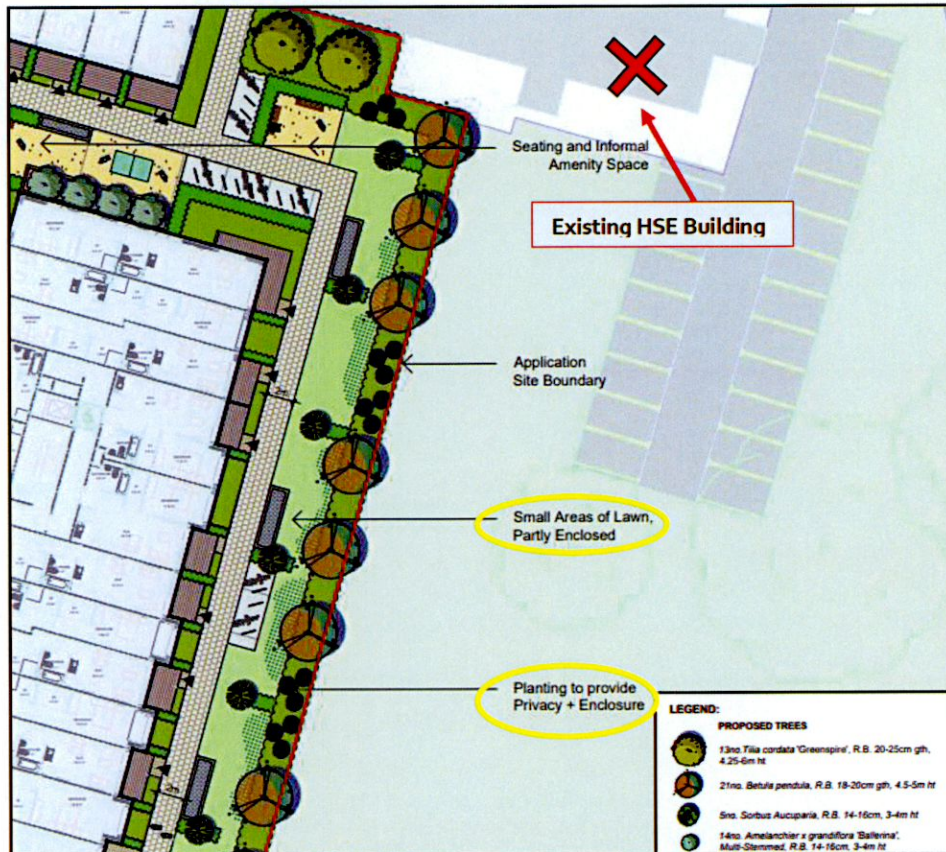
The Subject Site Western Boundary Landscaped Screening between the Adjacent Site and the Proposed Extension
